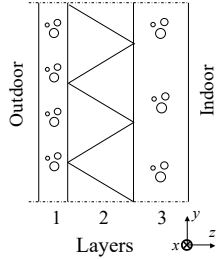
A concrete sandwich panel for load bearing walls, which consists of 70 mm-thick reinforced concrete (layer 1), 220 mm-thick rock wool for thermal insulation (layer 2) and 150 mm-thick reinforced concrete for structural bearing (layer 3). Electrical and thermal parameters of each layer is summarized in Table 1.
